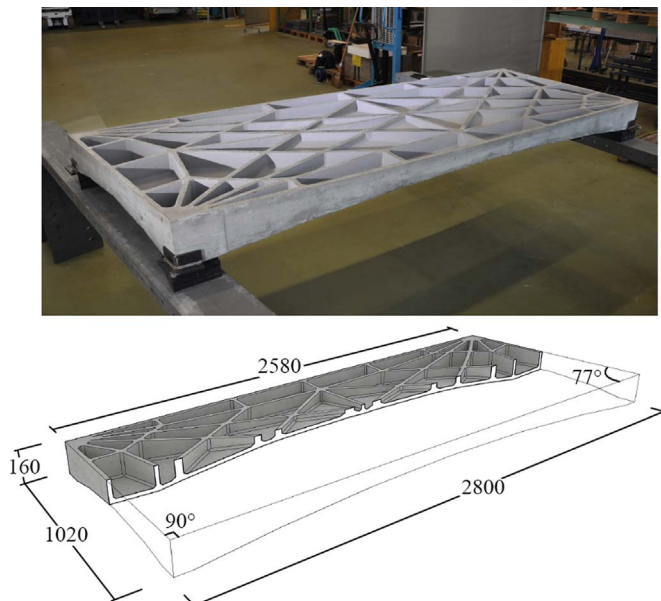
Initial structural prototype of the floor system (dimensions in mm) [10].
